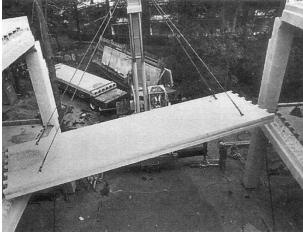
Precast deck beam suspended by four strand loops (Blodgett, K. et al.).
